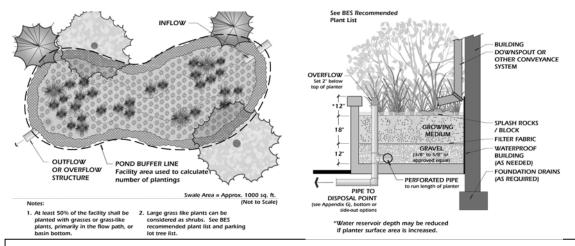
Plan of Vegetated Infiltration Basin and section of Planter Box
